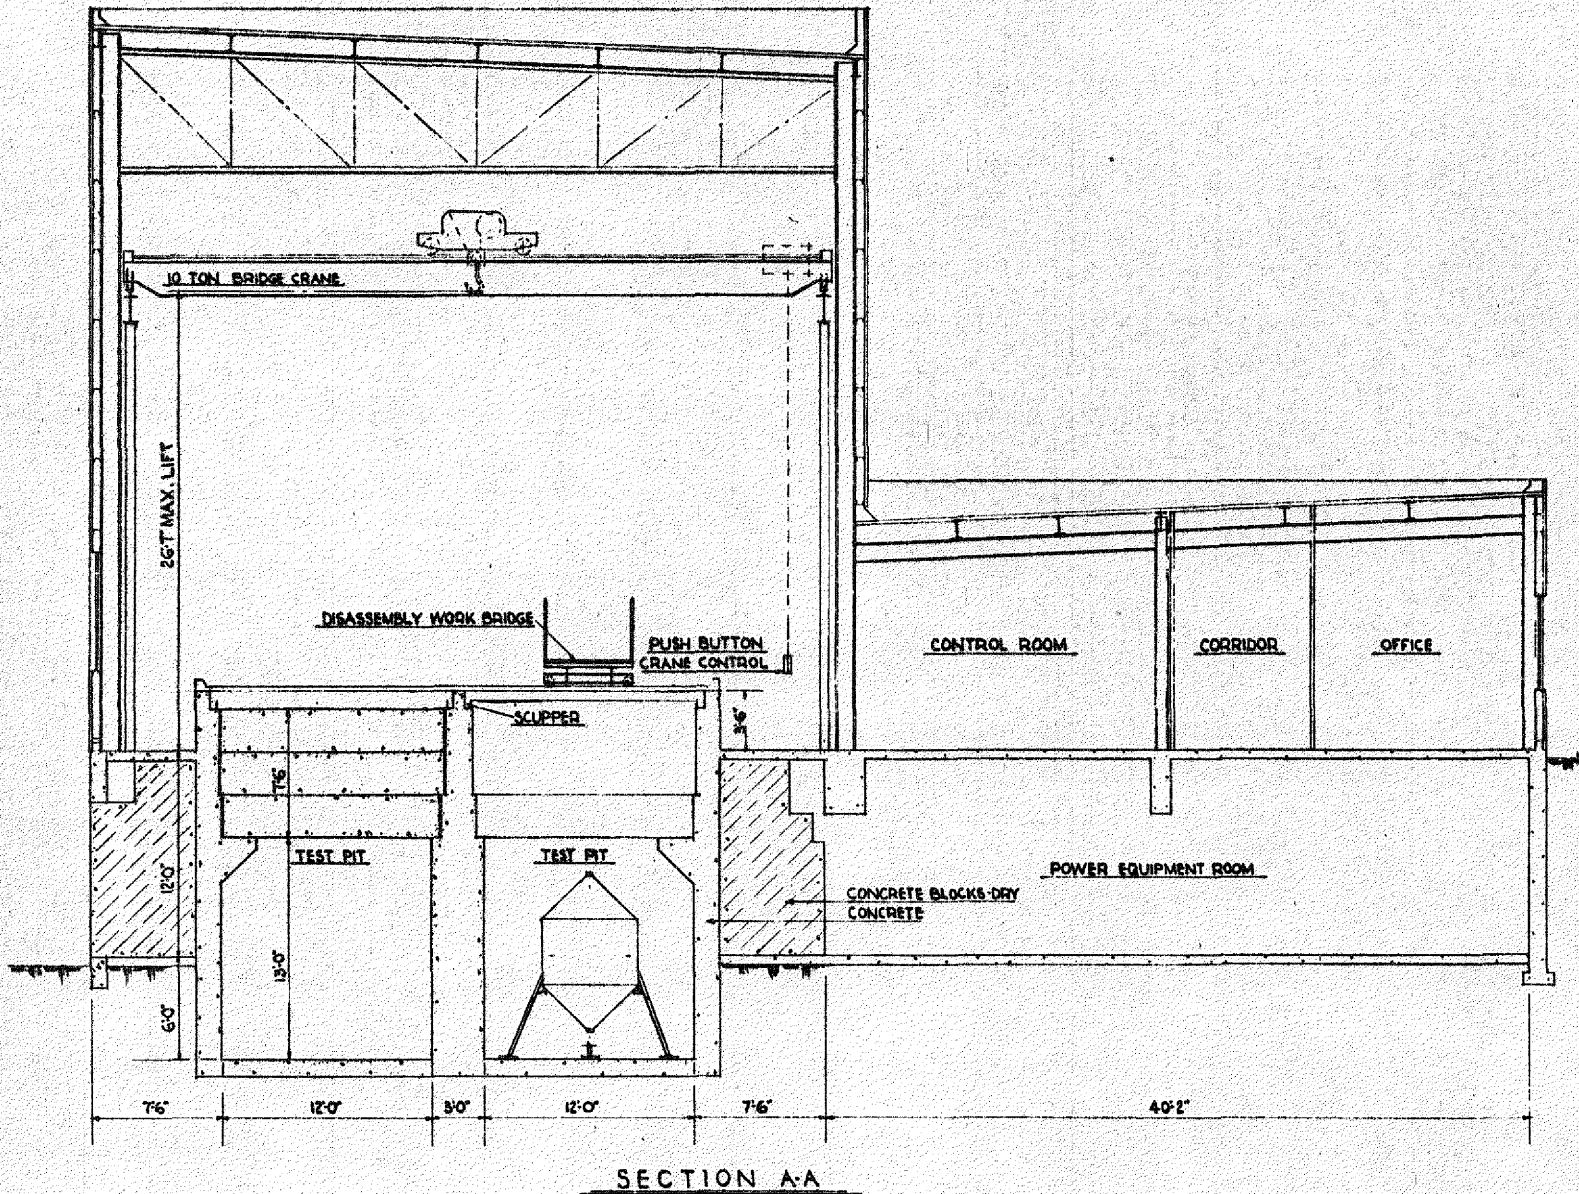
SECTION ELEVATION OF ARE TEST FACILITY BUILDING
